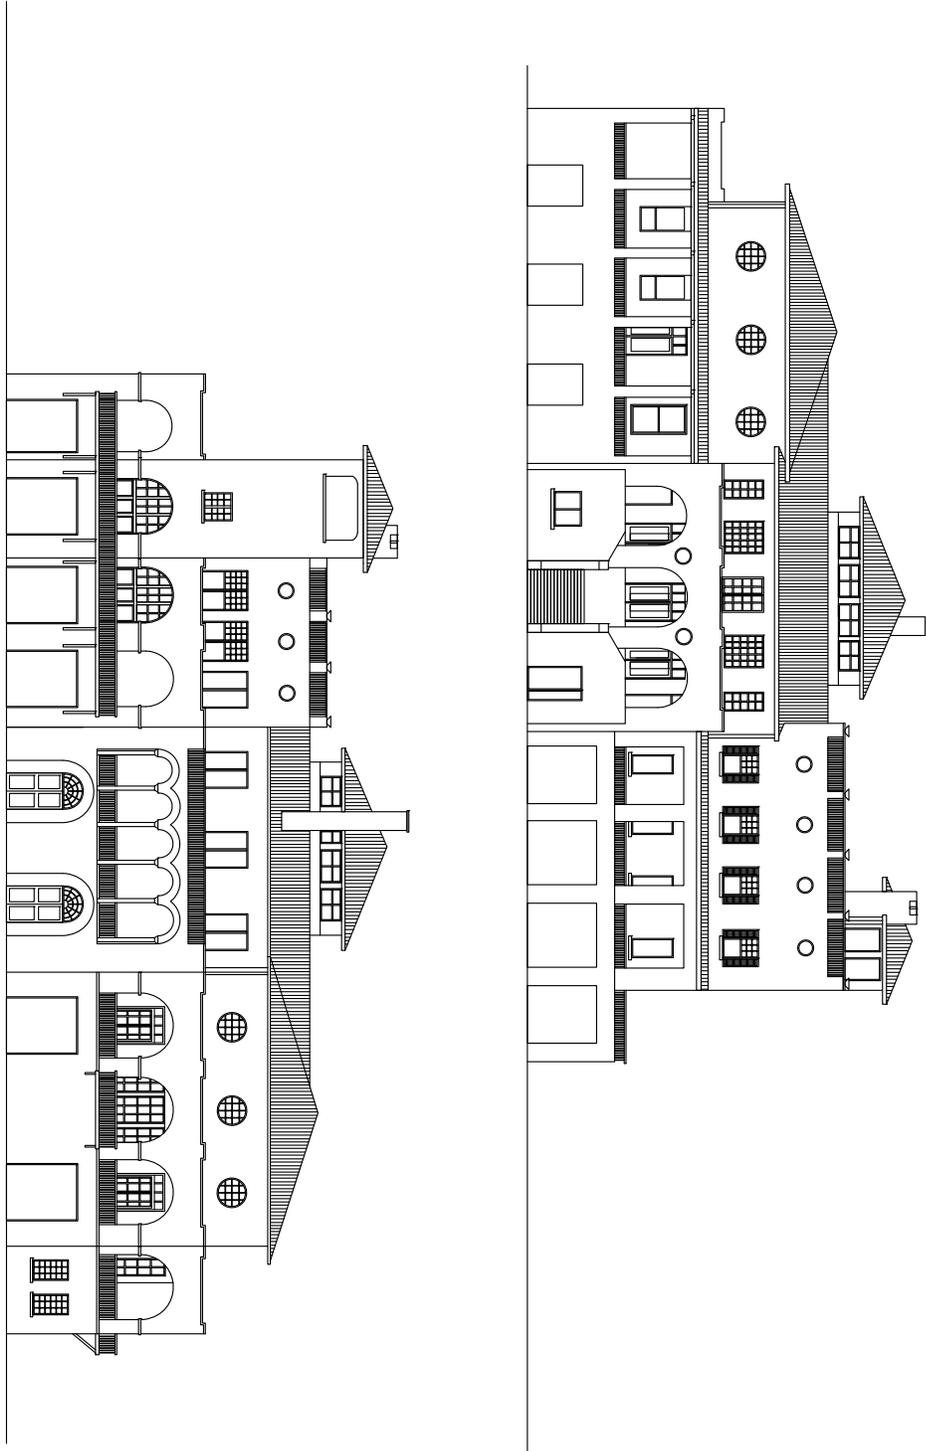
Detroit Boat Club, North and South Elevations, Original 1902 building, 2014 (Author)
